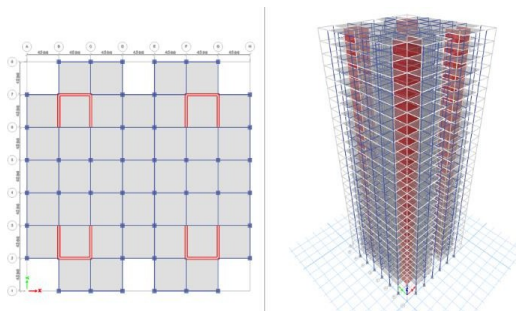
Plan of Structure Box- Shape shear Wall (Model 1)
